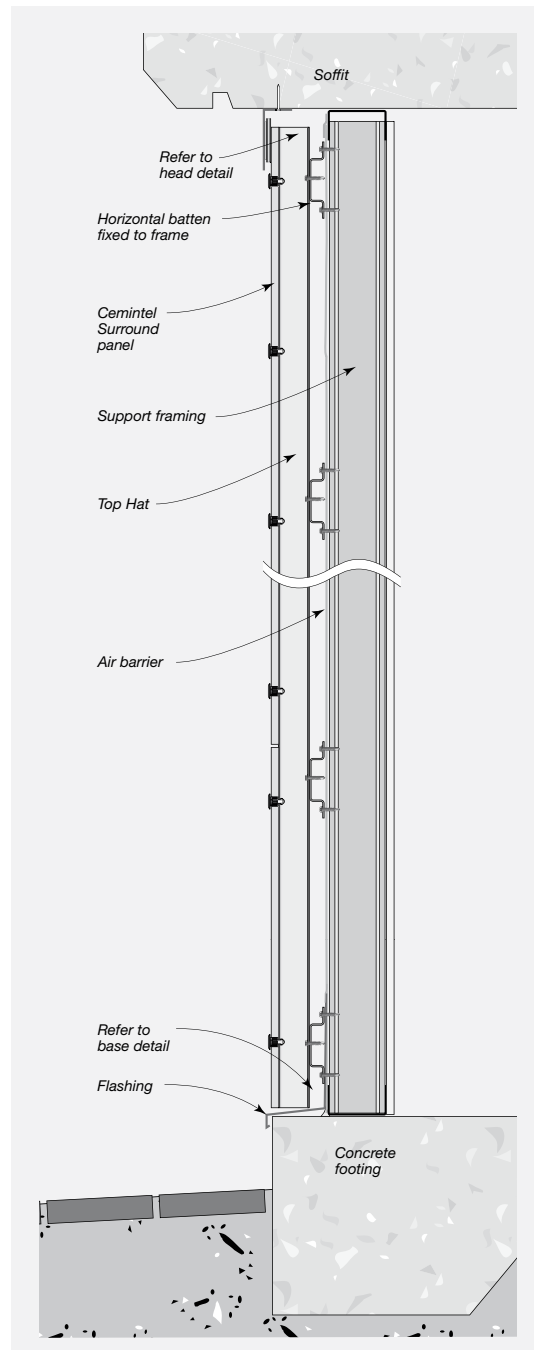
Typical Surround System Cross Section for Steel Framing – Elevation
